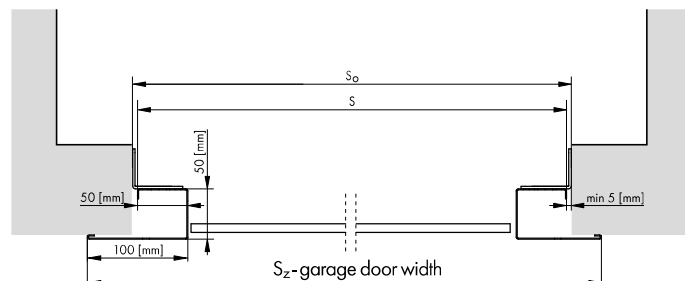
Installation in the opening (horizontal section) of door with renovation frame.
